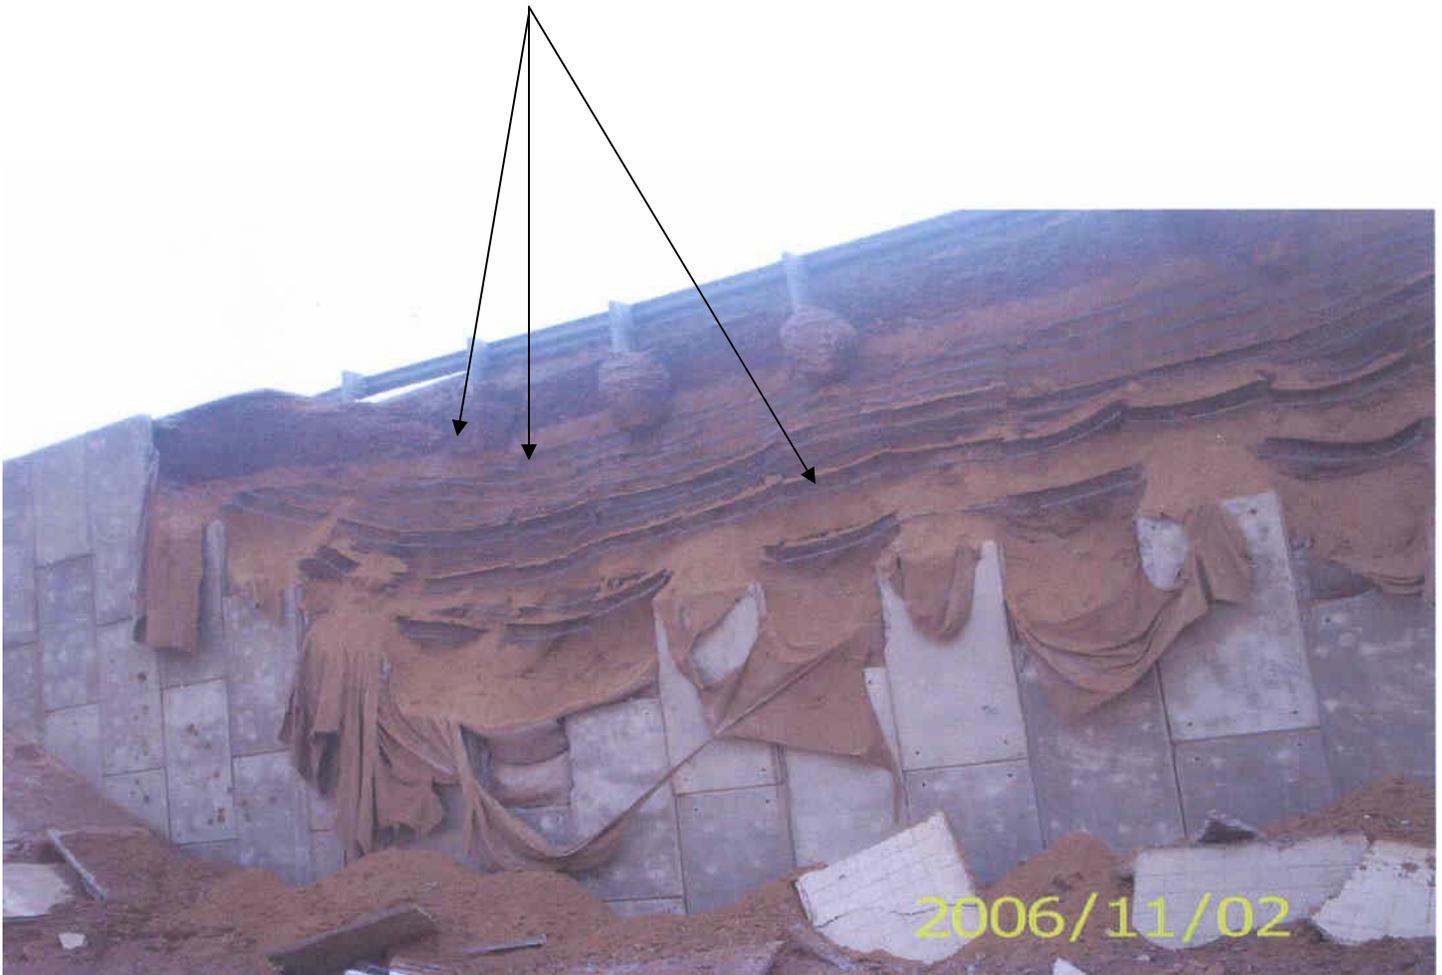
View of collapsed RSR wall, Exposed Geogrids are seen over the collapsed fill
